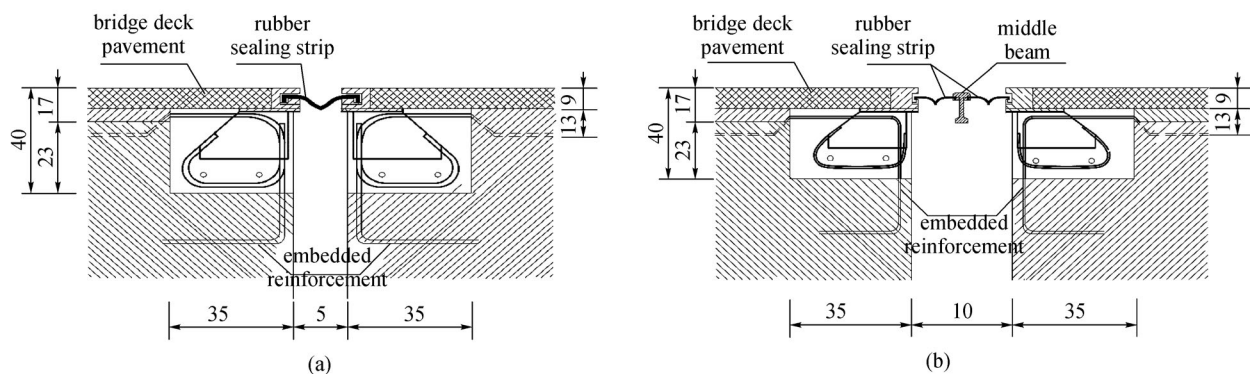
Layout of the expansion joint (unit: cm). (a) D80; (b) D160.
